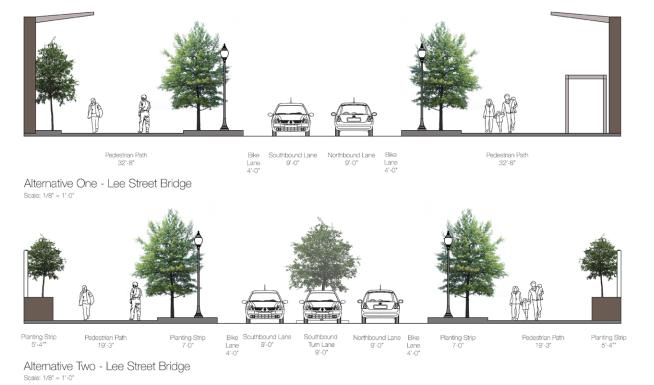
Lee Street Bridge Redesign Alternatives (Dimensions)
